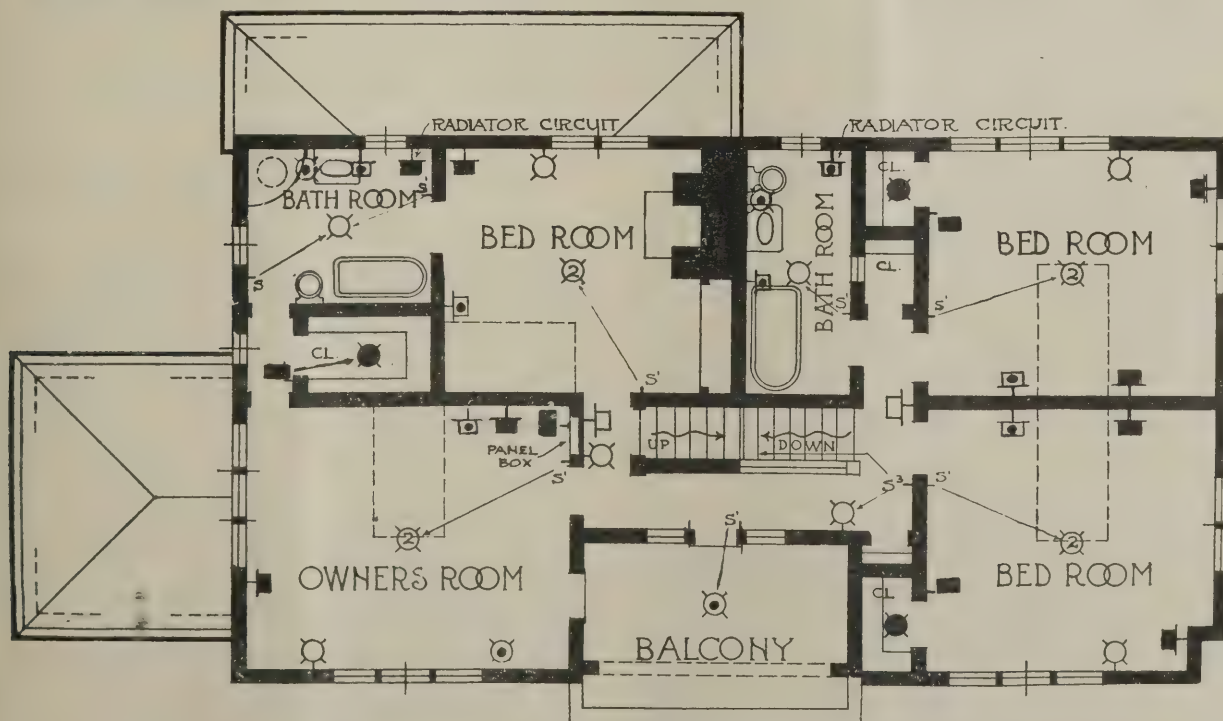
LAYOUT FOR SECOND FLOOR OF HOUSE OF WHICH FIG. 1 SHOWS THE FIRST FLOOR.
